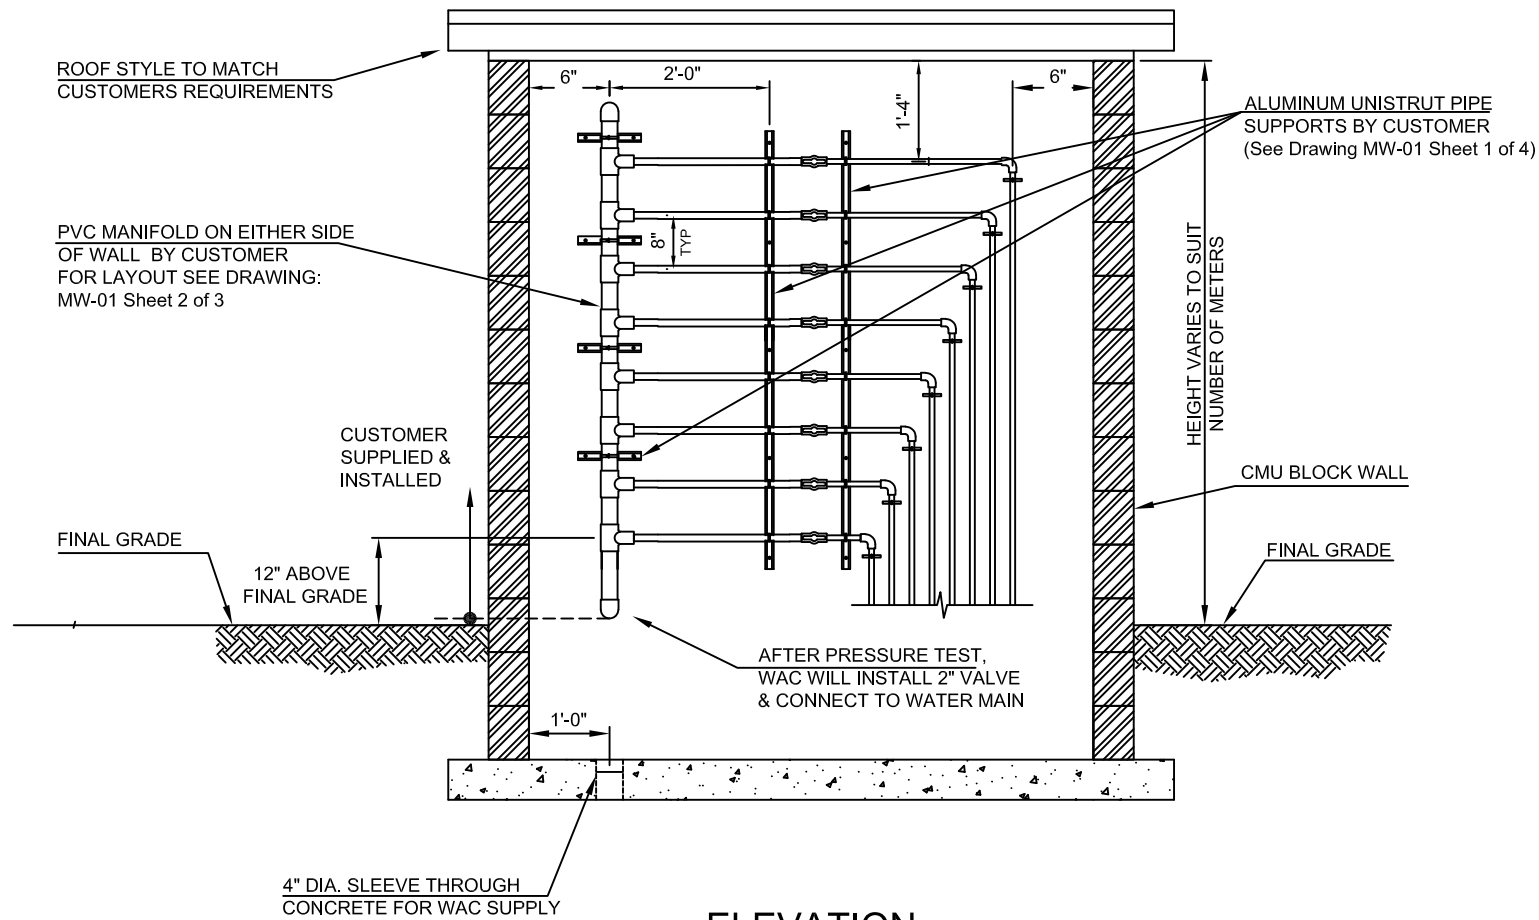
DETAILS & DIMENSIONS FOR SIDE-BY-SIDE AND BACK-TO-BACK WALLS SIMILAR TO SINGLE WALL
